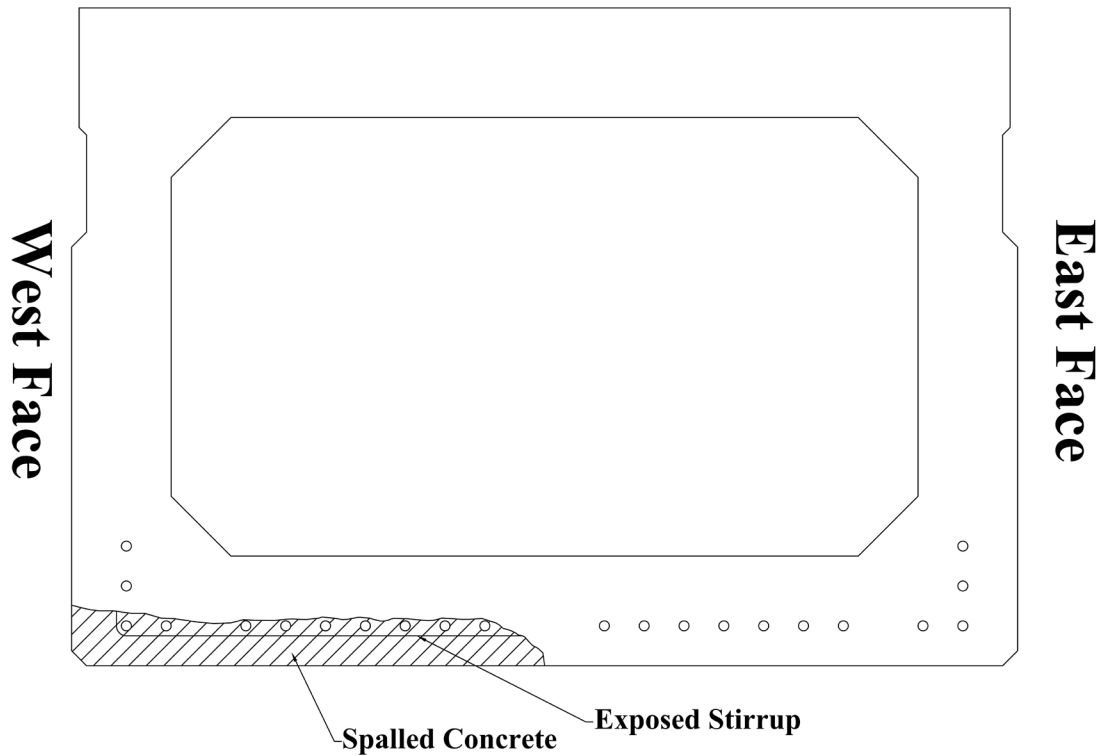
Cross section of Sections 3 and 4 of Specimen E3 after testing
